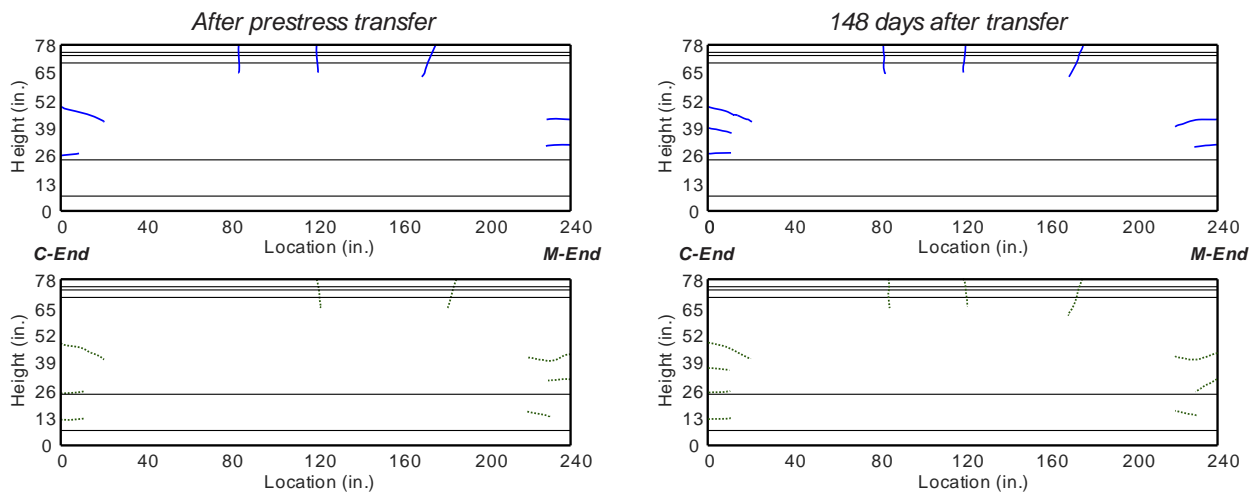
SH-30 Crack patterns shown on North face of specimen. Solid blue lines depict cracks visible on the North face and dashed green lines depict cracks visible on the South face.
